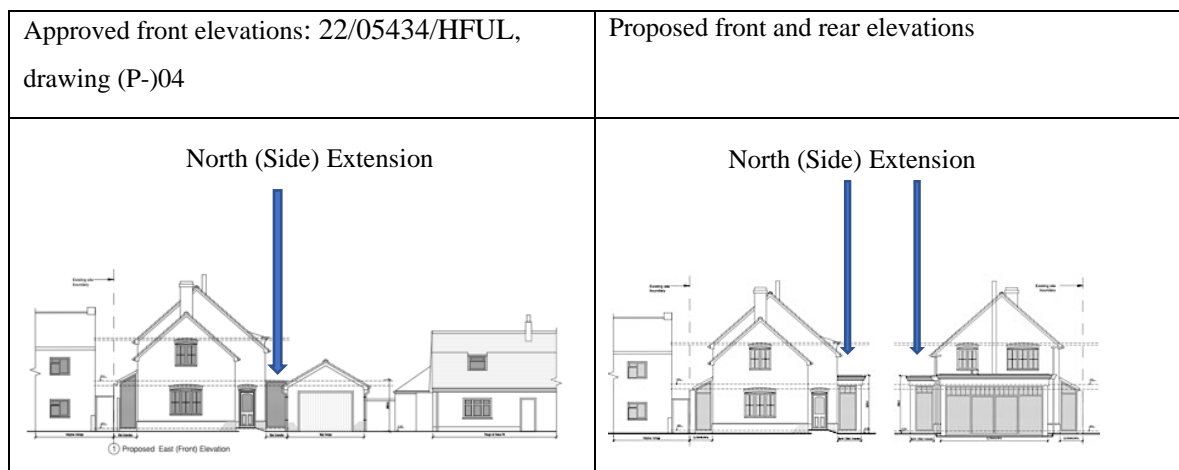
Comparison of the approved elevations as per Ref No:22/05434/HFUL and Proposed Elevations at Elizabeth House, High Street, Horningsea, CB25 9JG
